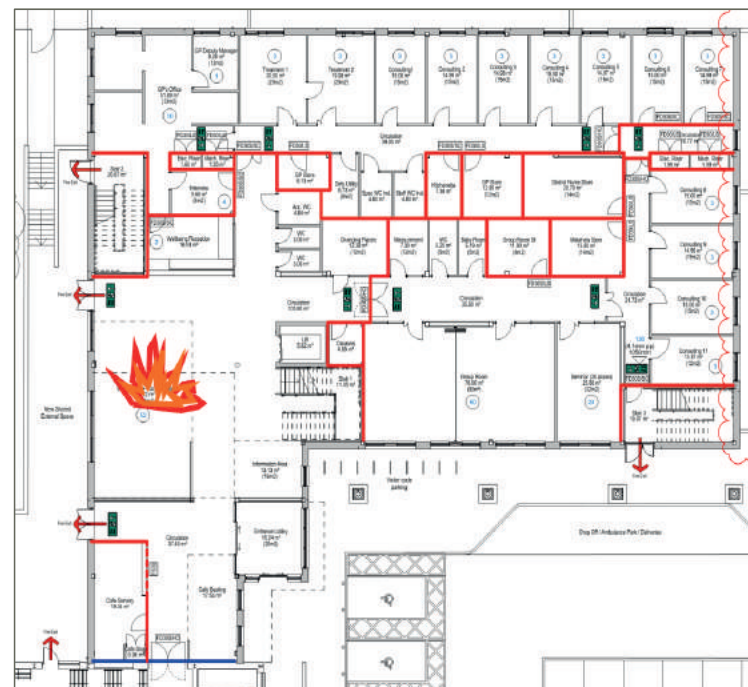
Evacuation strategy at ground floor in case of a fire in the waiting area (storey exits in green, final exits in red)
